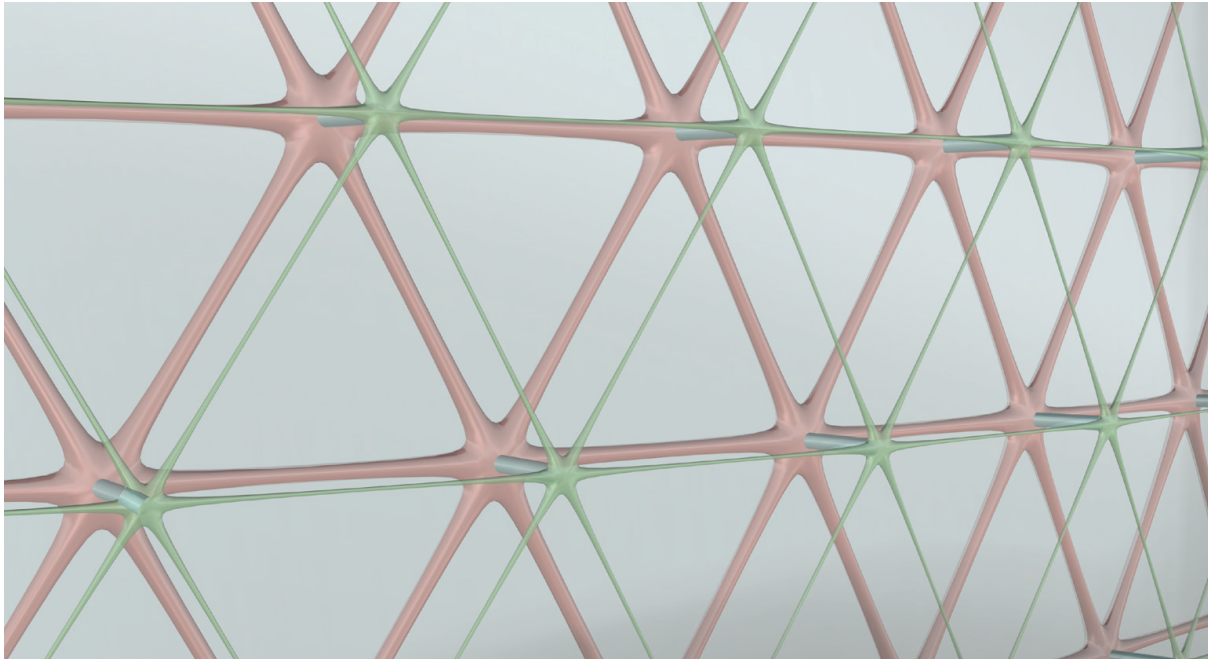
Stainless steel Sub- Structure components installed on TRIO's facade.
